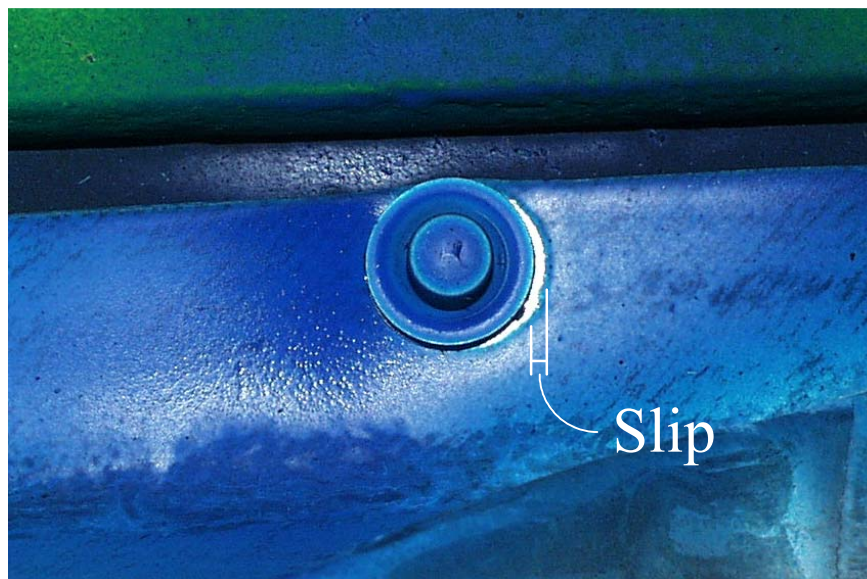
SLIP IN END FASTENER EXPOSING UNPAINTED DECK SURFACE
